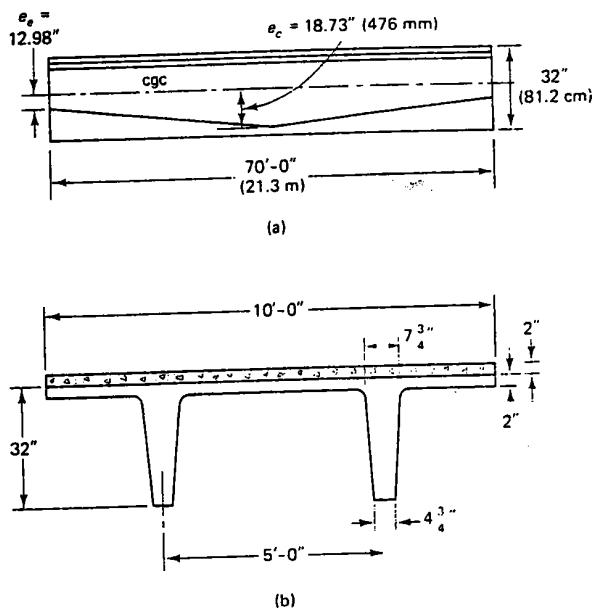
Double-T pretensioned beam. (a) Elevation. (b) Pretensioned section.
